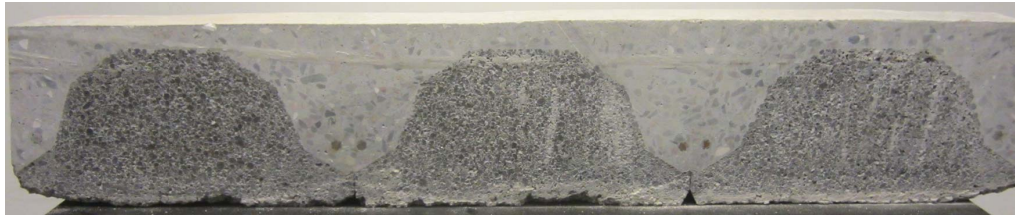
The lightweight aggregate block, dimensions and shape.
